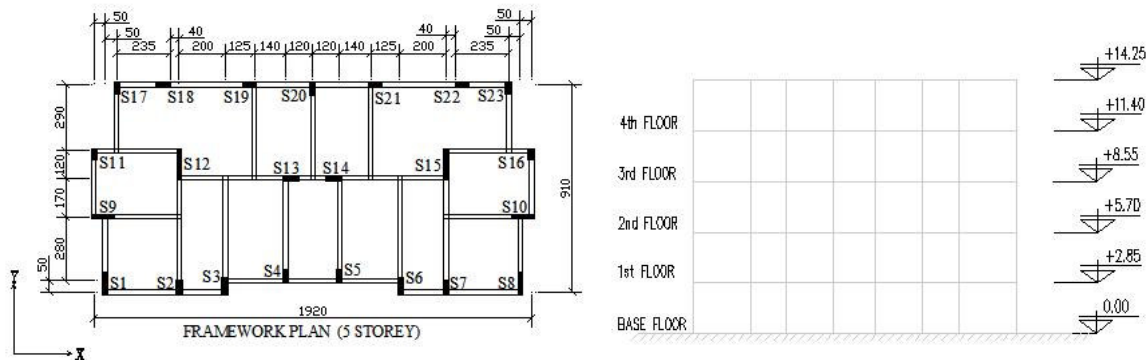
(a) Plan View (cm), (b) Lateral View (m).
